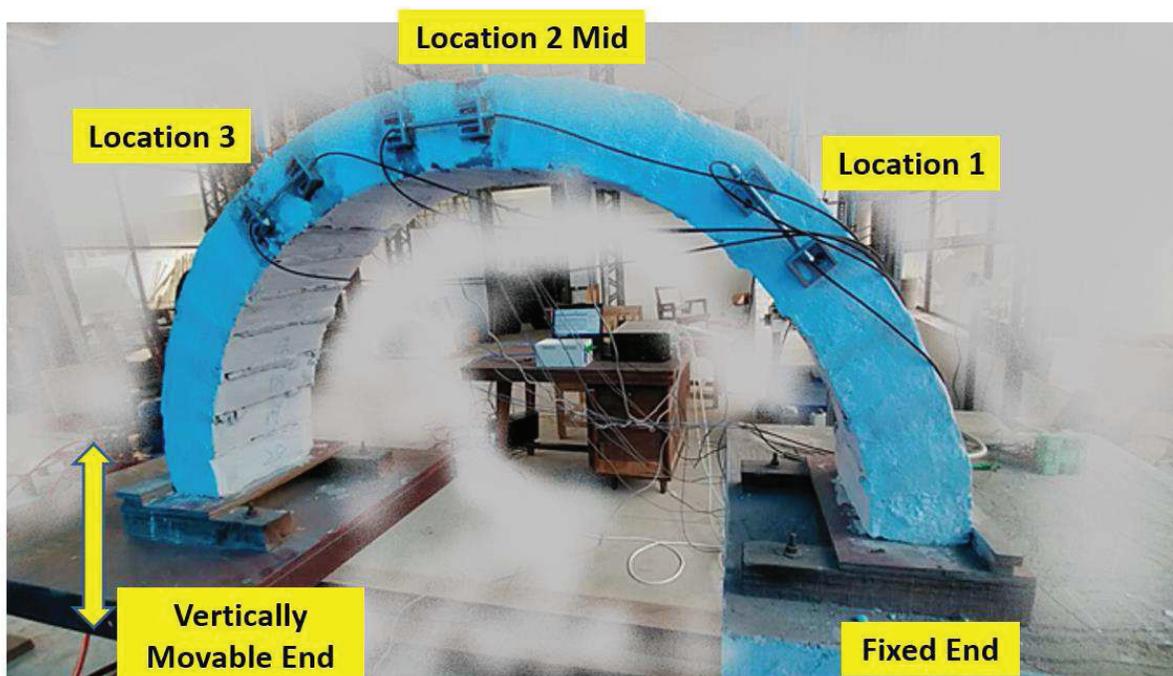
Brick masonry arch mounted with 3 FBG sensors
